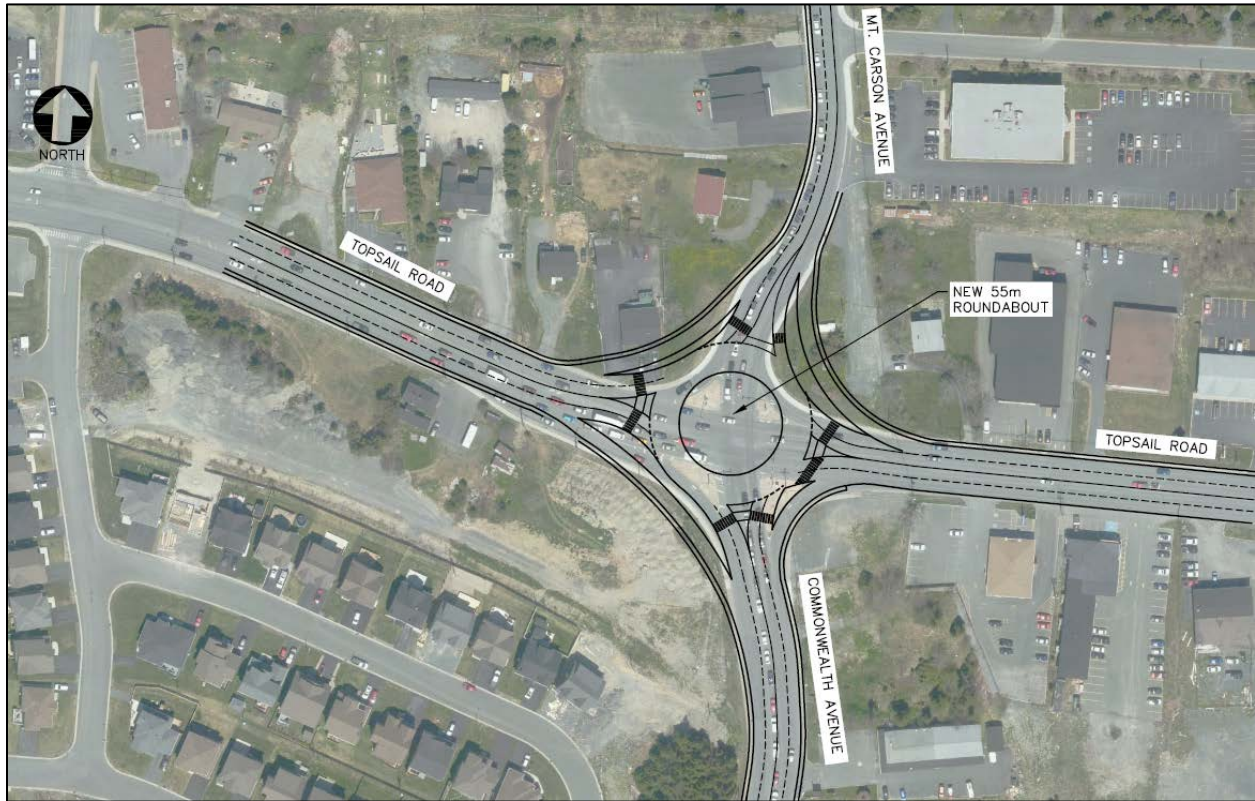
Roundabout at Topsail Road & Mount Carson Avenue/Commonwealth Avenue
